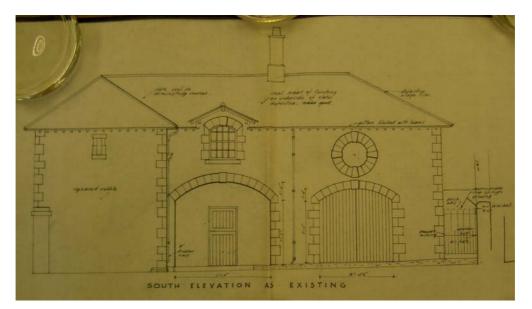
Coach House south elevation as existing in 1966 (BDB 33/12/9 1966-9)
